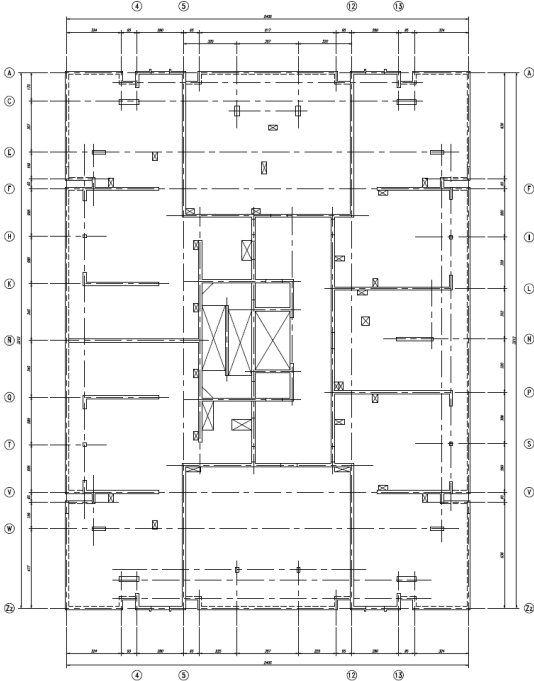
Alto Huerto building (San Pedro de la Paz-Chile) – Typical plan view.
